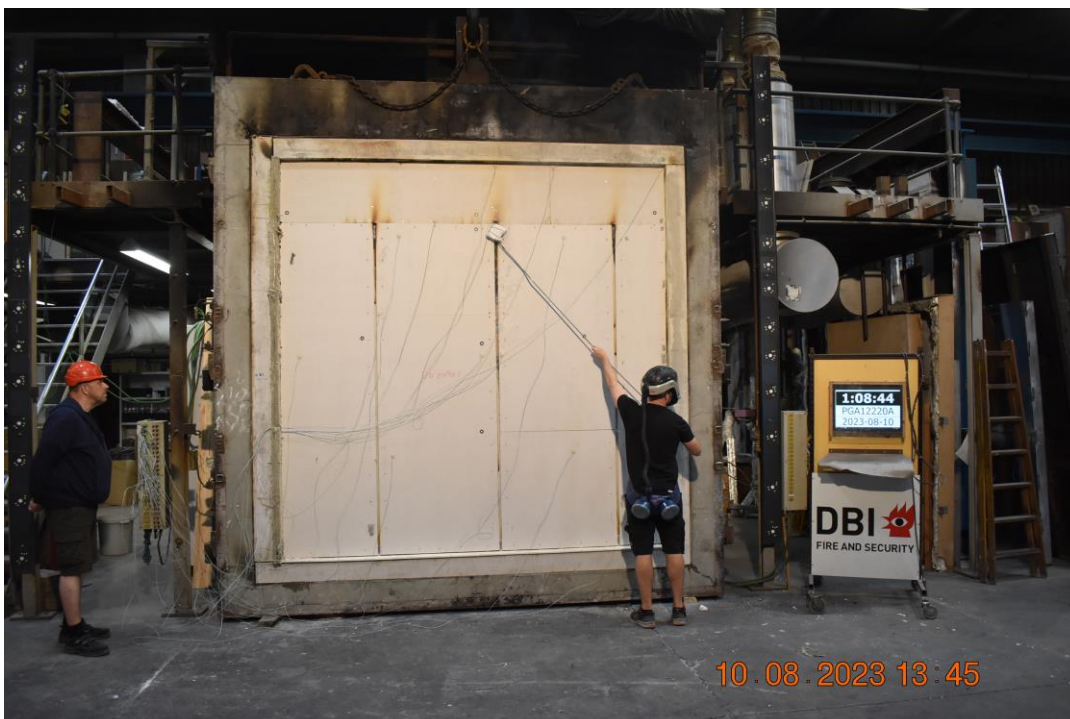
Test specimen after 68 minutes of testing. Eight cotton pad test.
